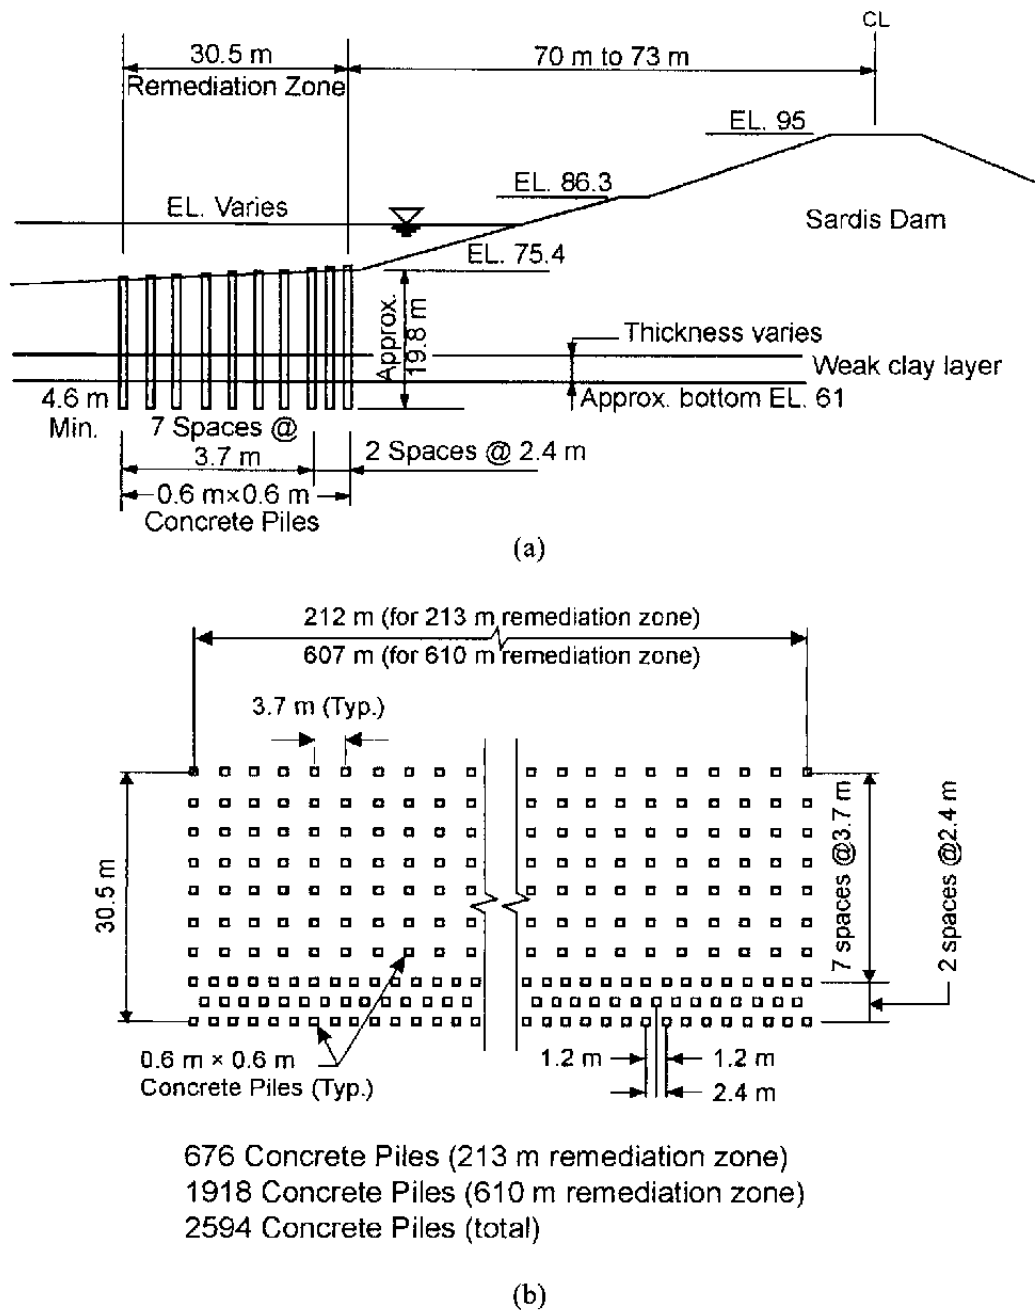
Final form of pile reinforced section of Sardis Dam: (a) elevation, (b) plan (after Stacy et al., 1994).
